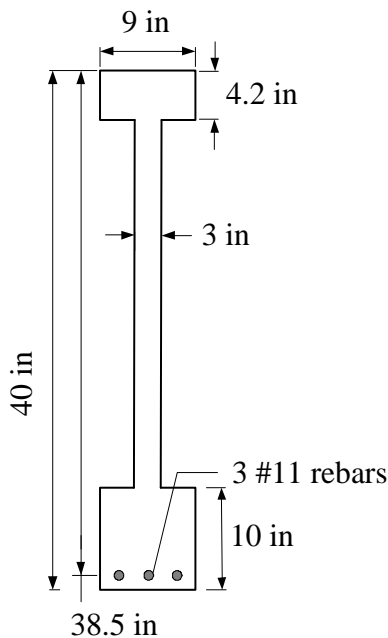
Section dimension and arrangement of longitudinal reinforcement steel rebars for section UHP/St60 40I-3
